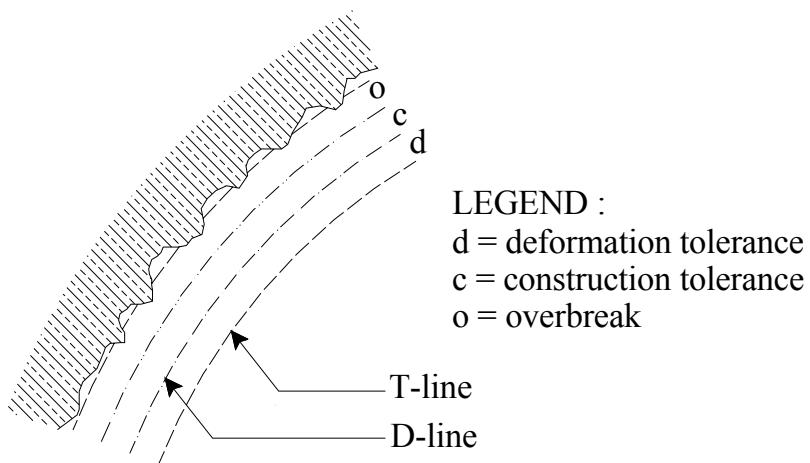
Excavation Tolerances (Astaldi, 2004)
